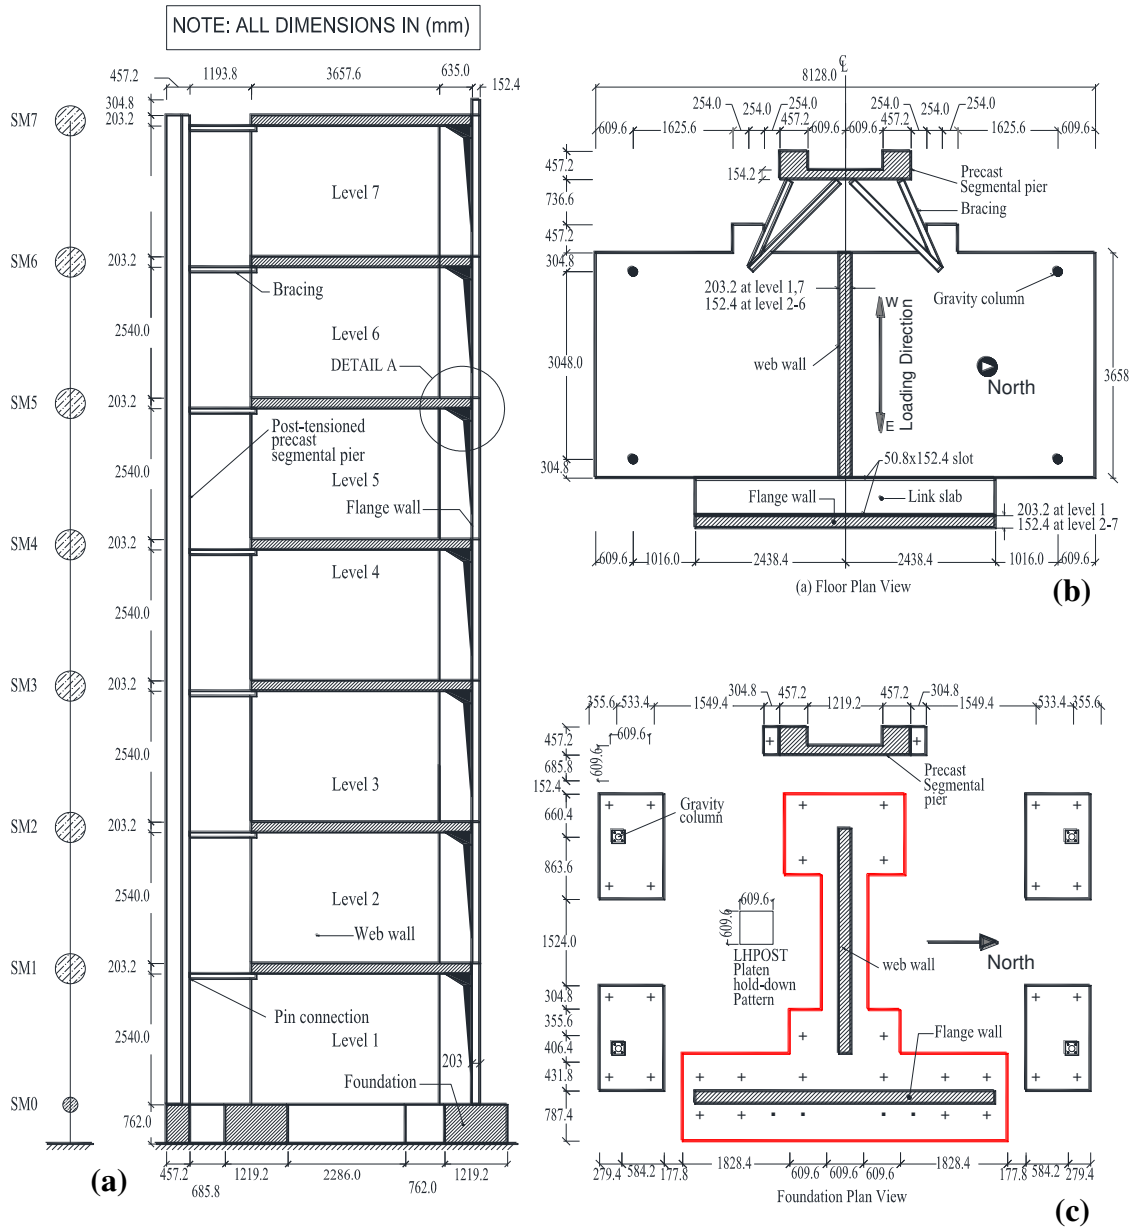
Test structure used in modelling verification: (a) Elevation; (b) Floor plan view; and (c) Foundation plan view
